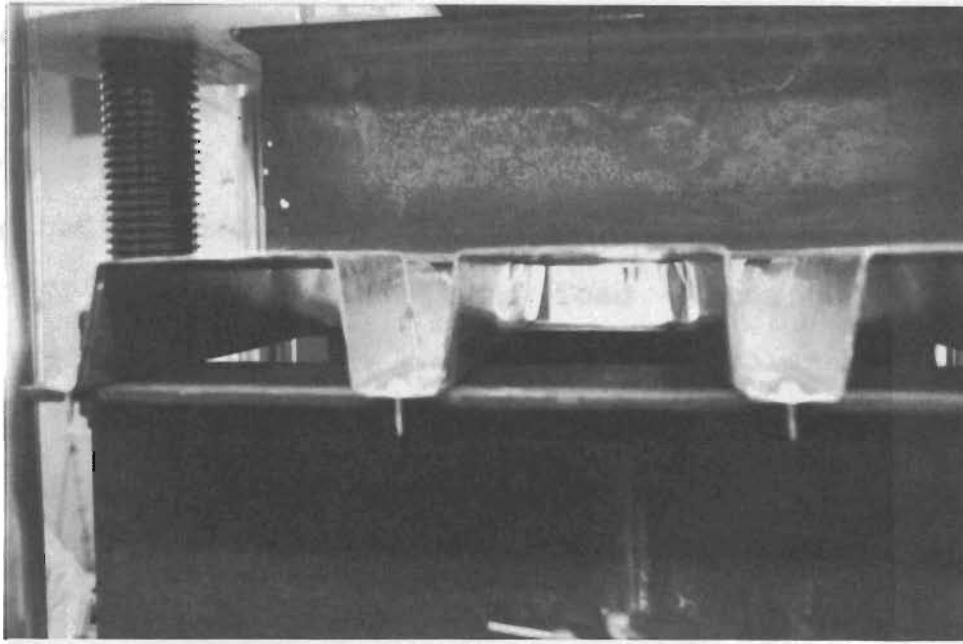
Photograph of a Typical Failure of a Floor Deck Specimen Subjected to EOF Loading with Unrestrained Flanges.
